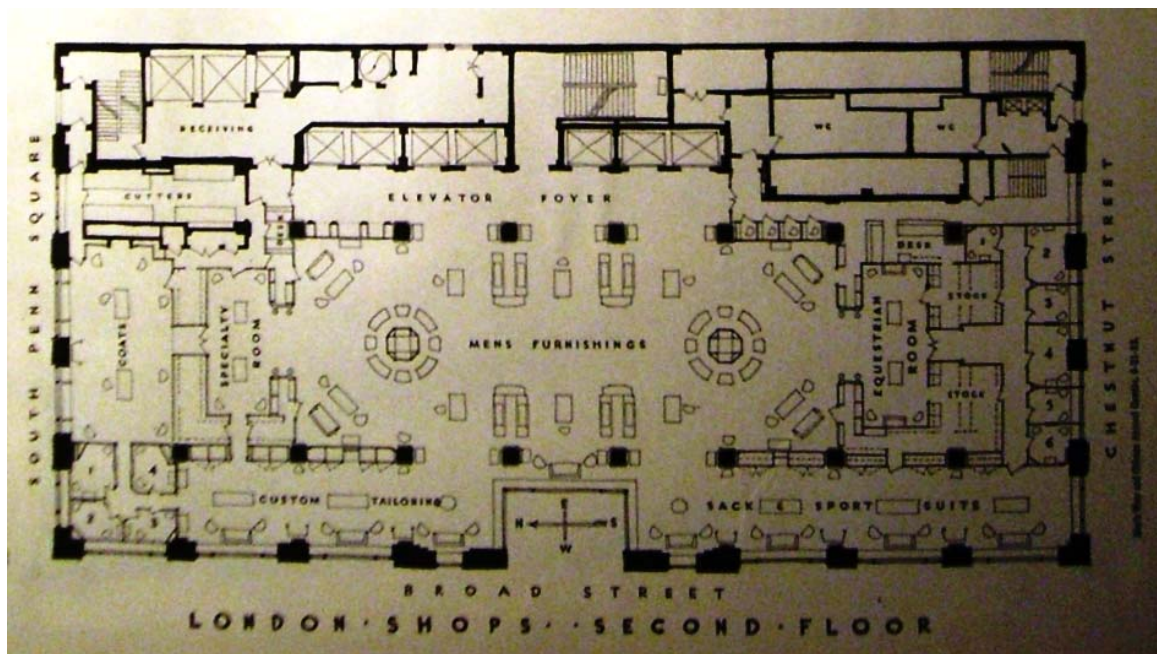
Floor plan of second floor “London Shop”, Wanamaker Men's Store
